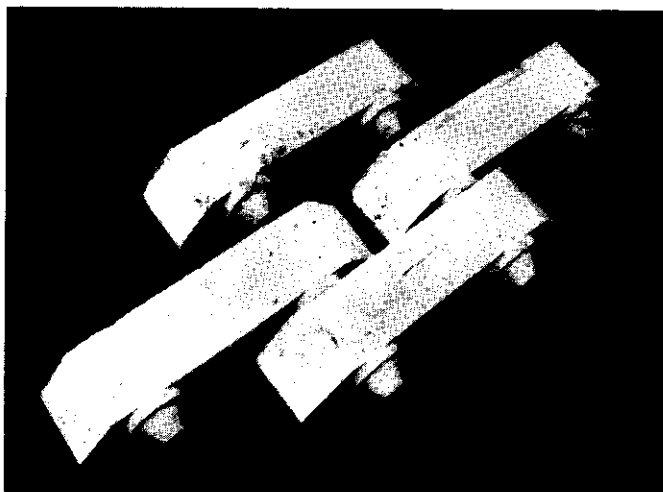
Interlocking concrete blocks of the "terrafix"-revetment system
